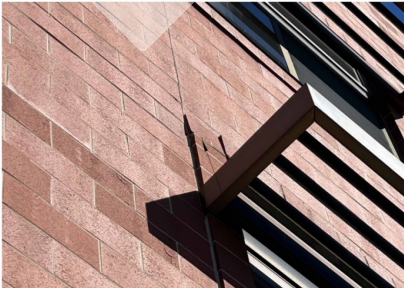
MASONRY FAILURE LOCATED AT WINDOW HEADER
